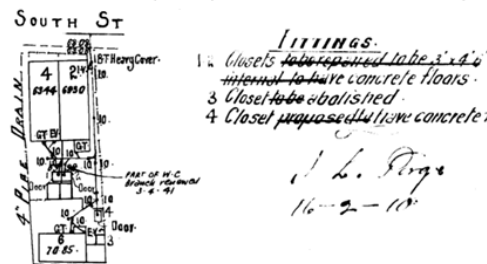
Metropolitan Drainage Board, 1910 Plan of Drainage for the site showing 2, 4 and 6 South Street as separate residences. Source: Council archives, plan H2599.
